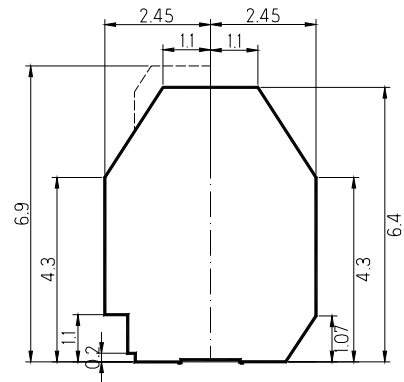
(b) Construction Gauges of Railway Crossing
